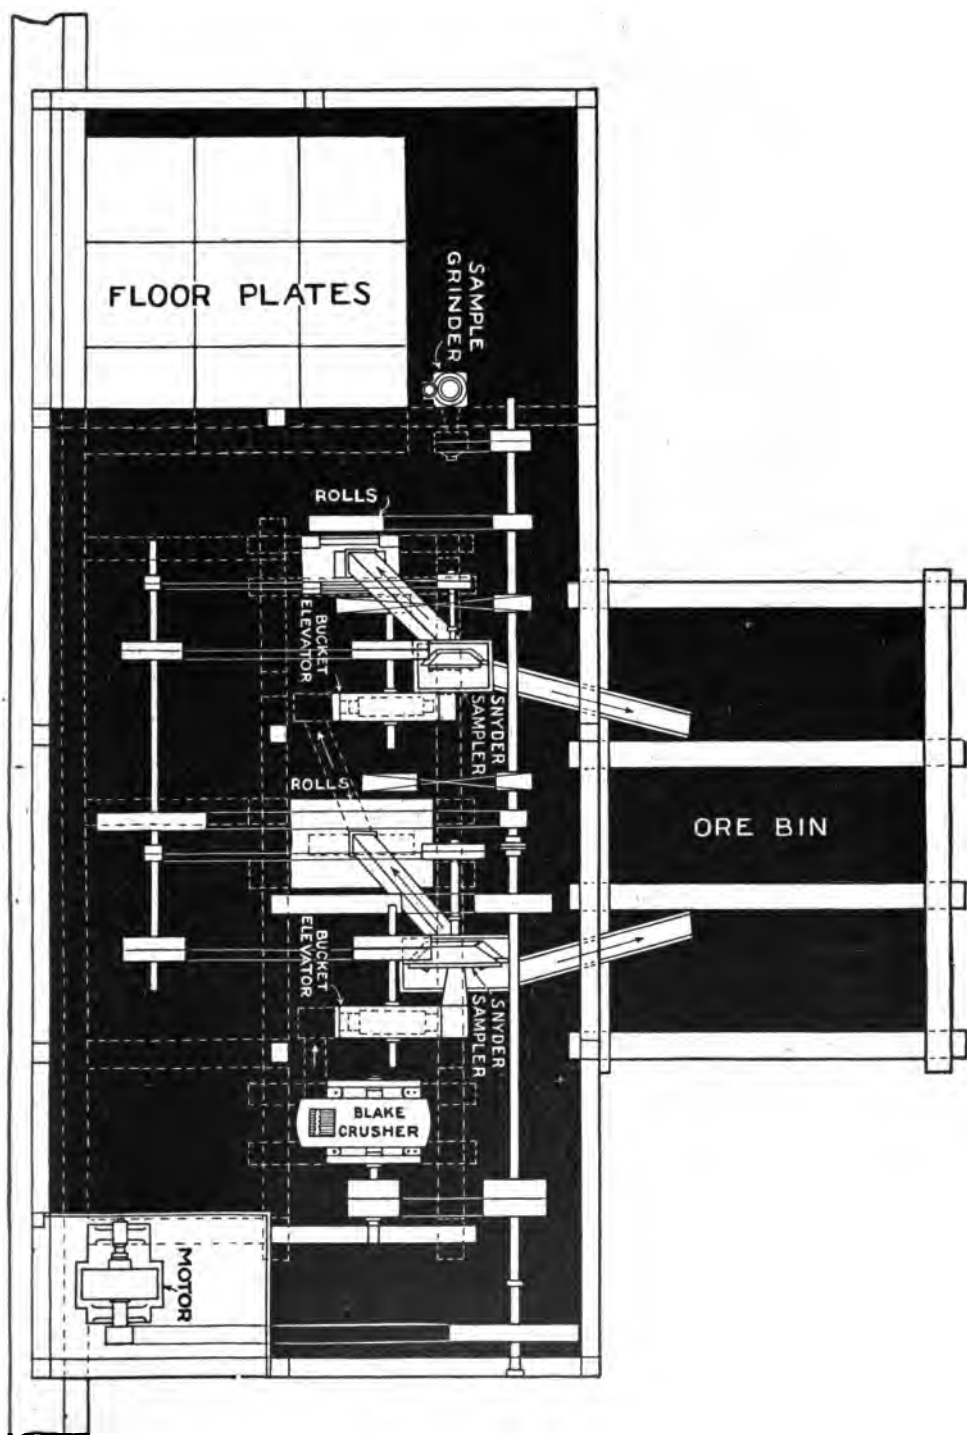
PLAN OF SMALL AUTOMATIC SAMPLING PLANT.
